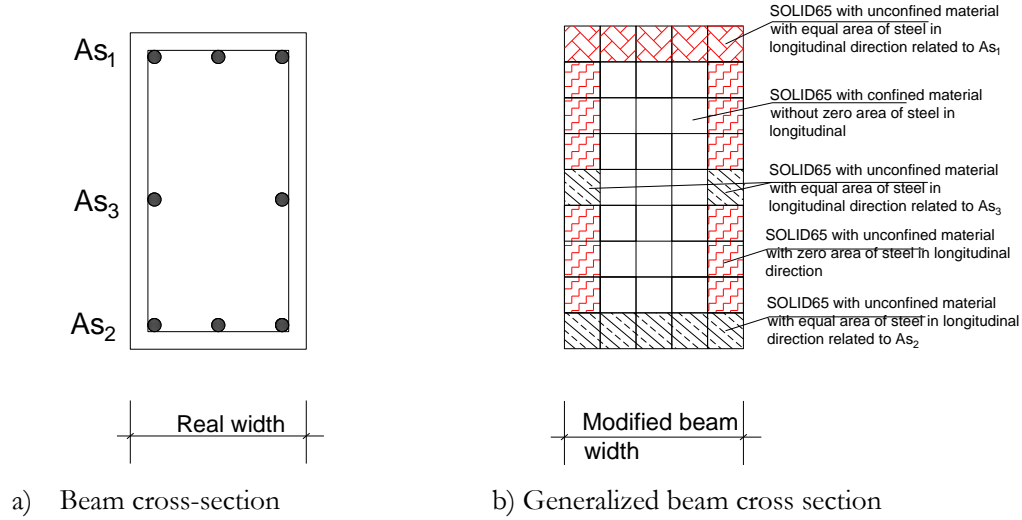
Description of the beam cross-section considered in the proposed modelling approach
